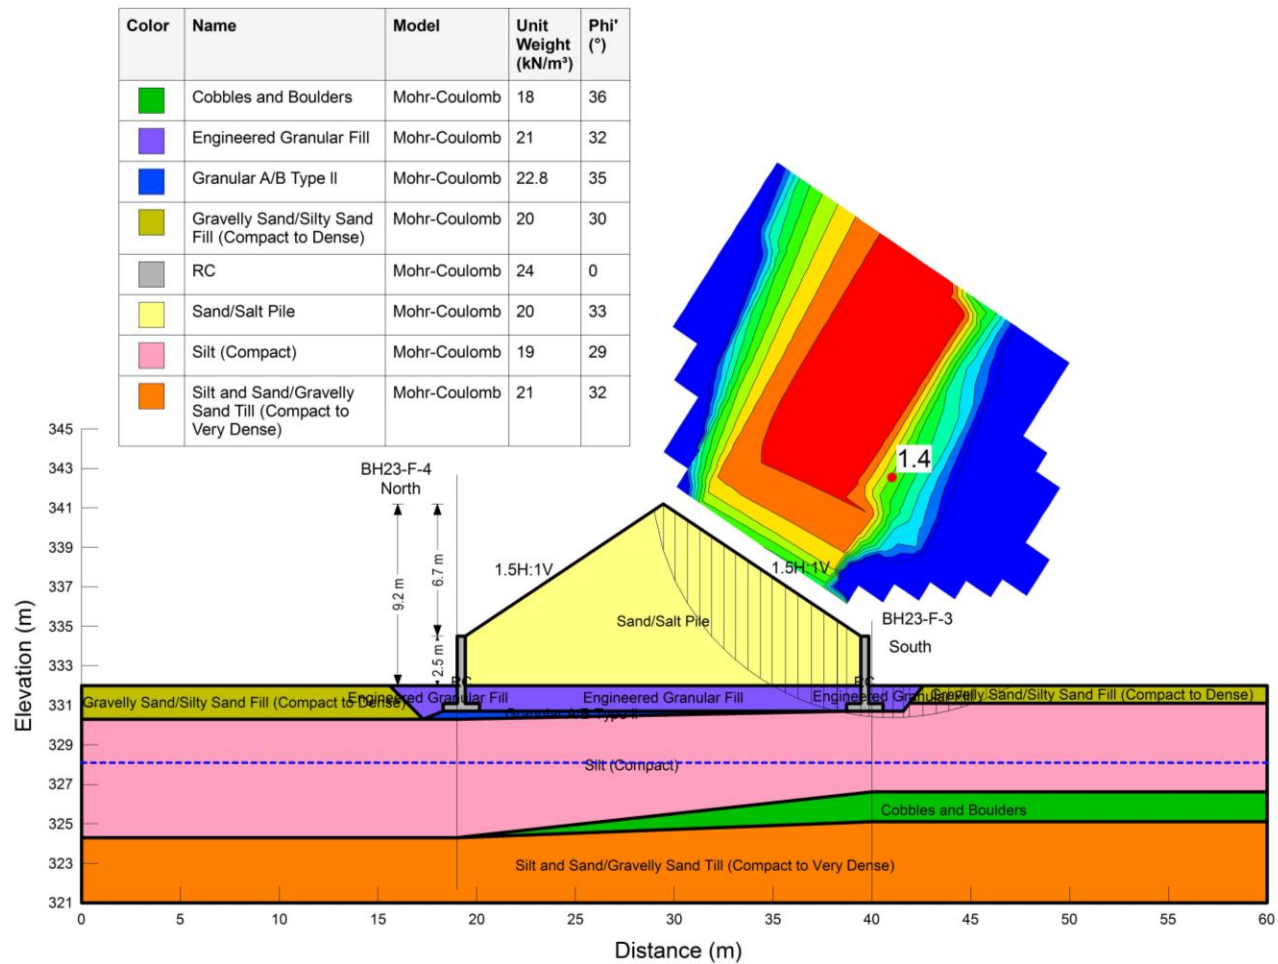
Slope stability analysis of new material storage building – N-S section, west side wall – drained static analysis
